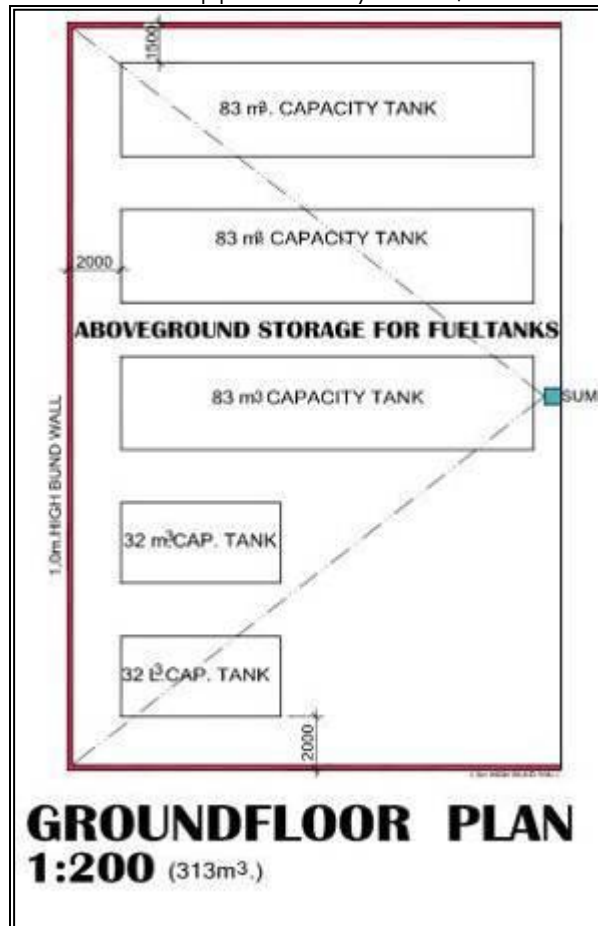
Proposed bund structure (9m x 25m), not constructed.
